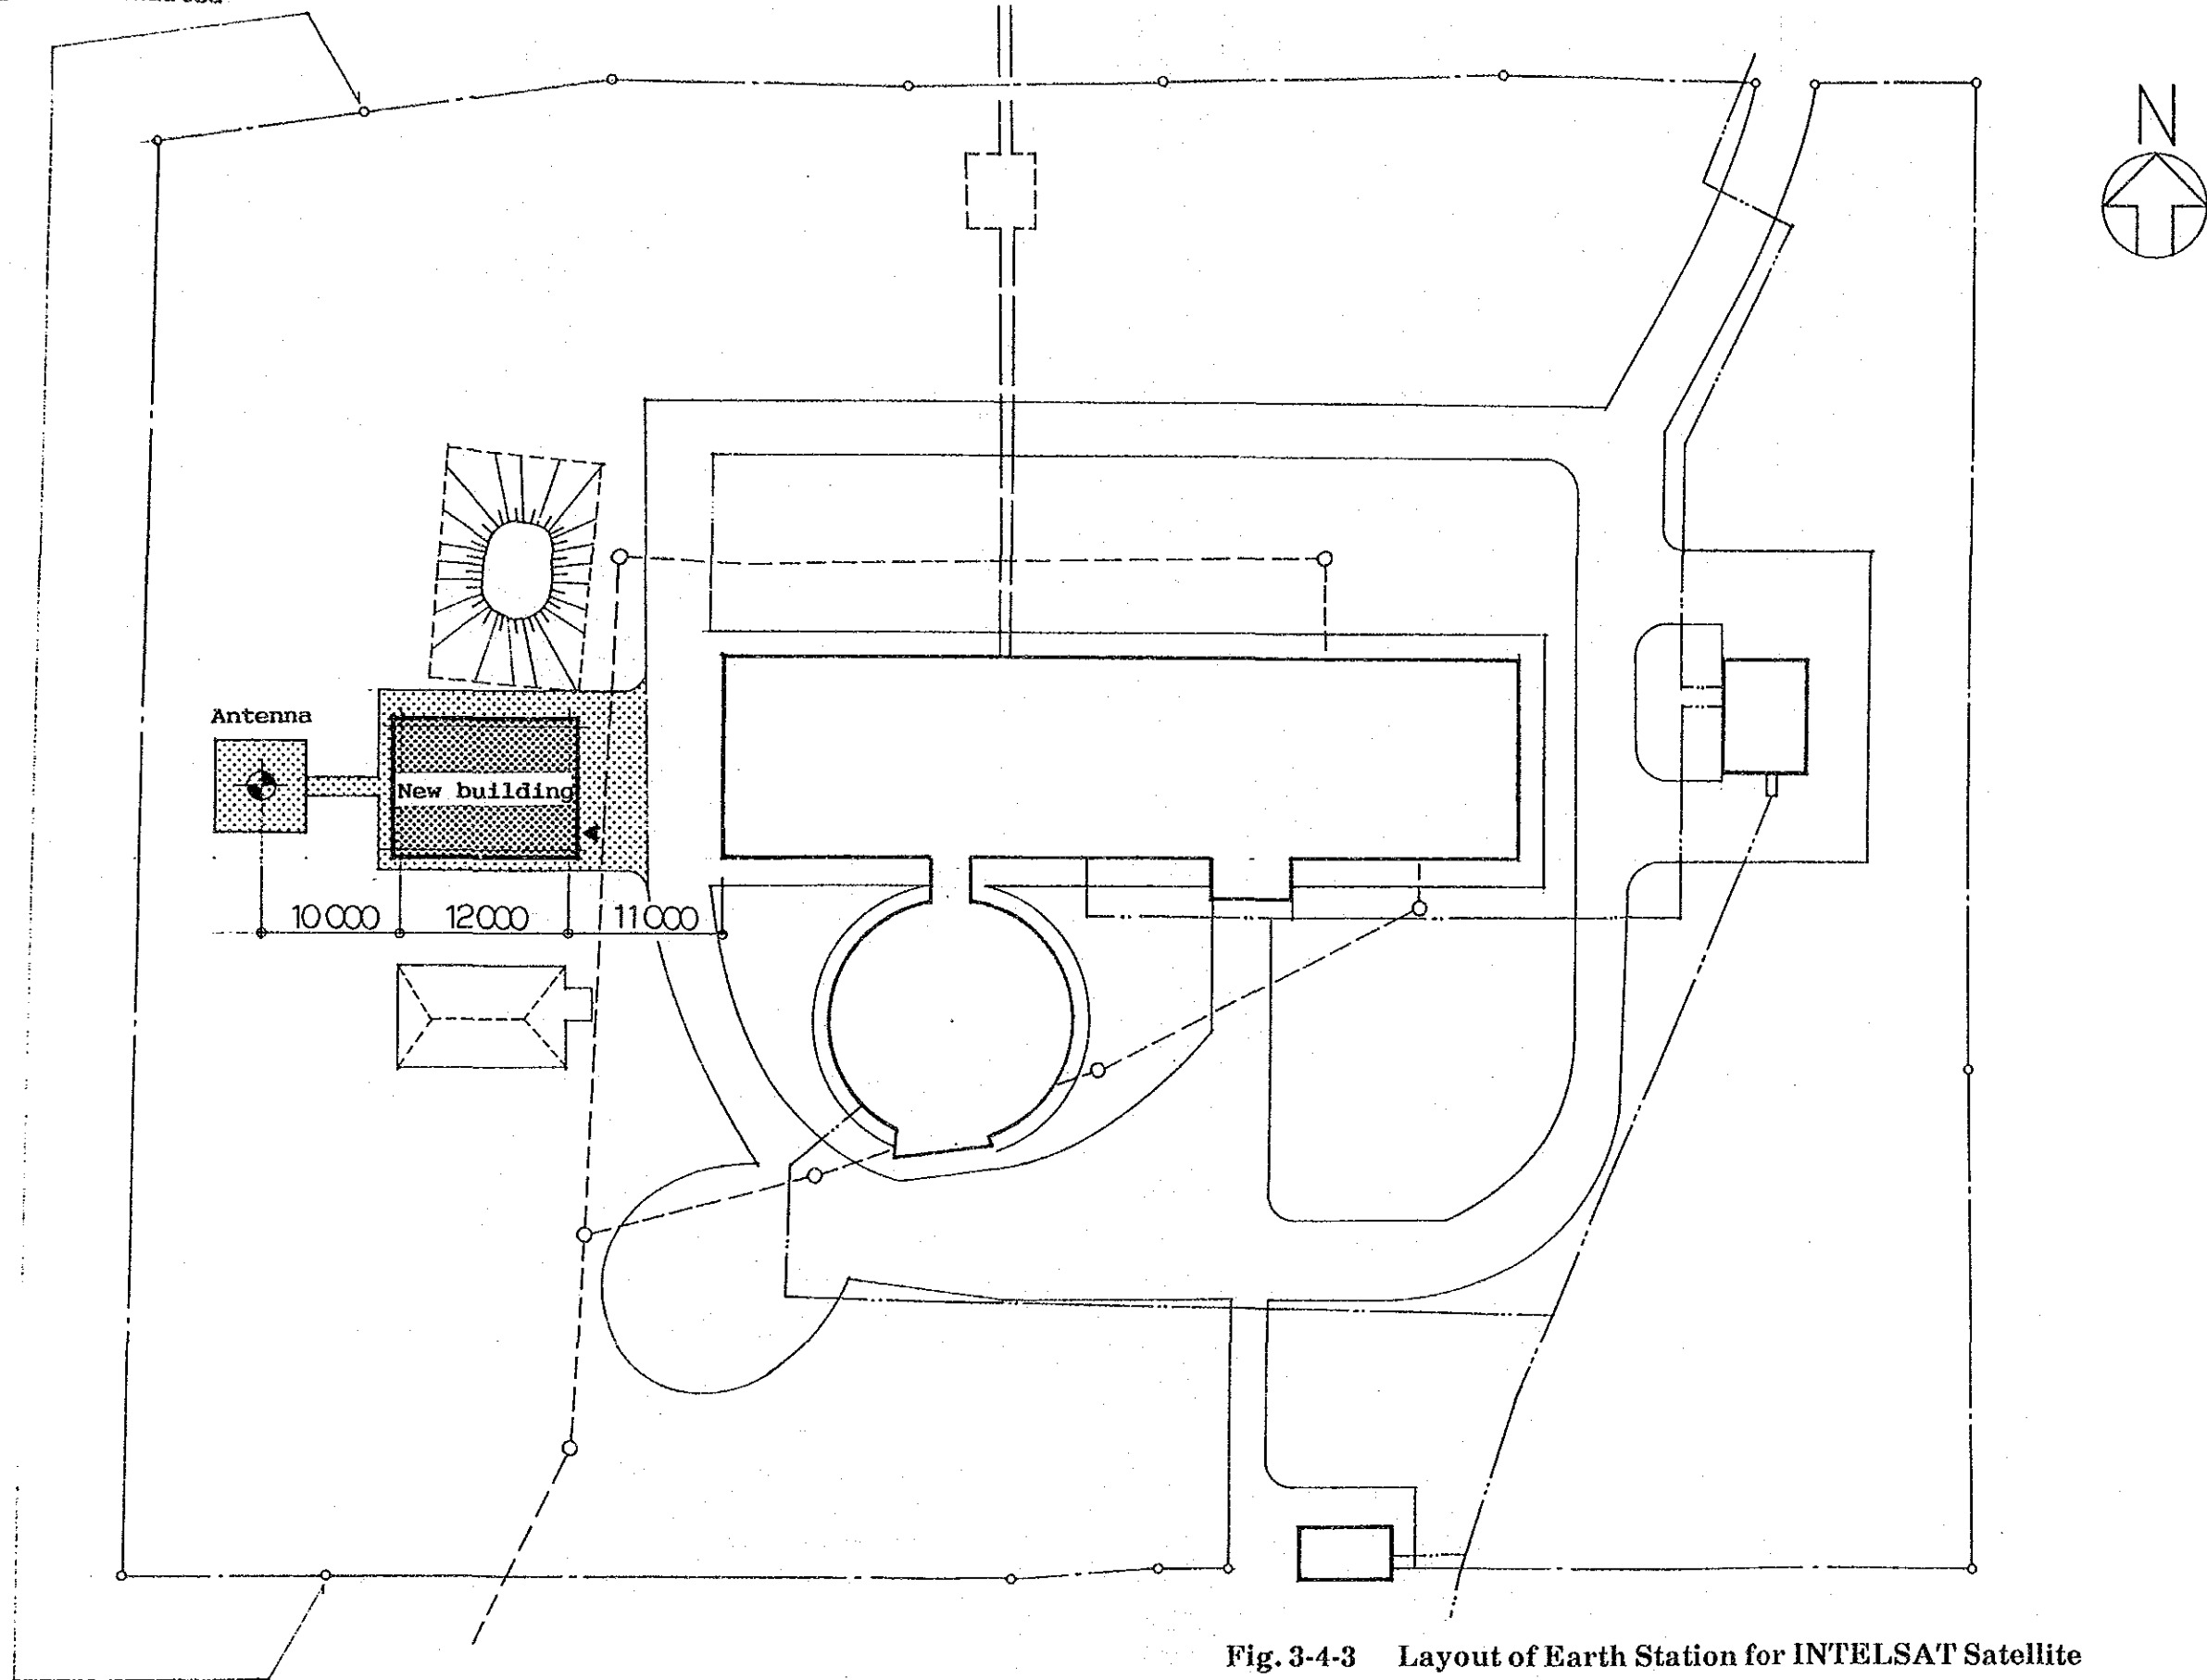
Layout of Earth Station for INTELSAT Satellite
